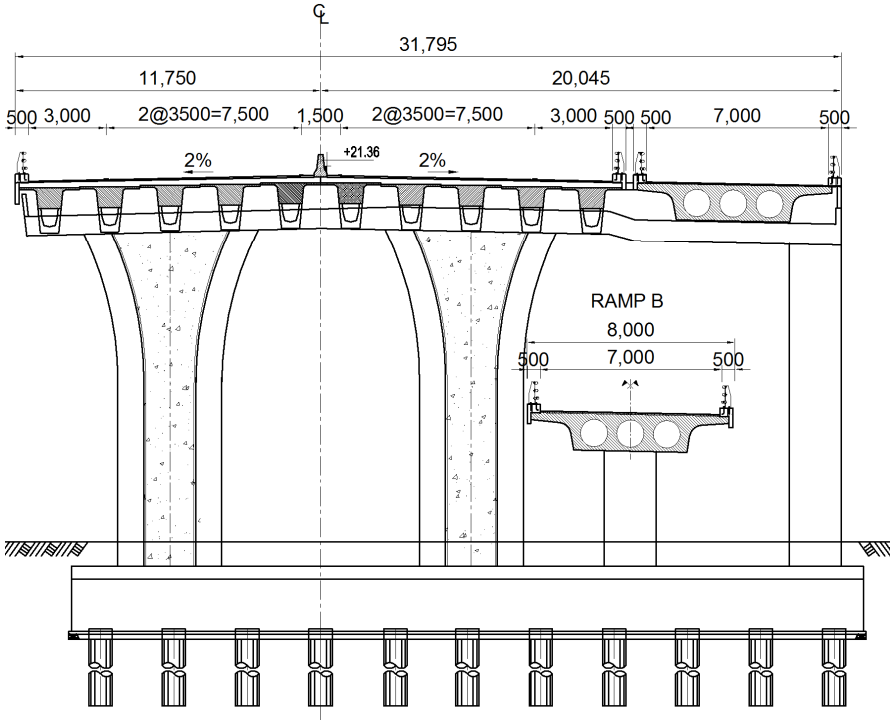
Cross-section of Ramp Way Bridge (PB13)
